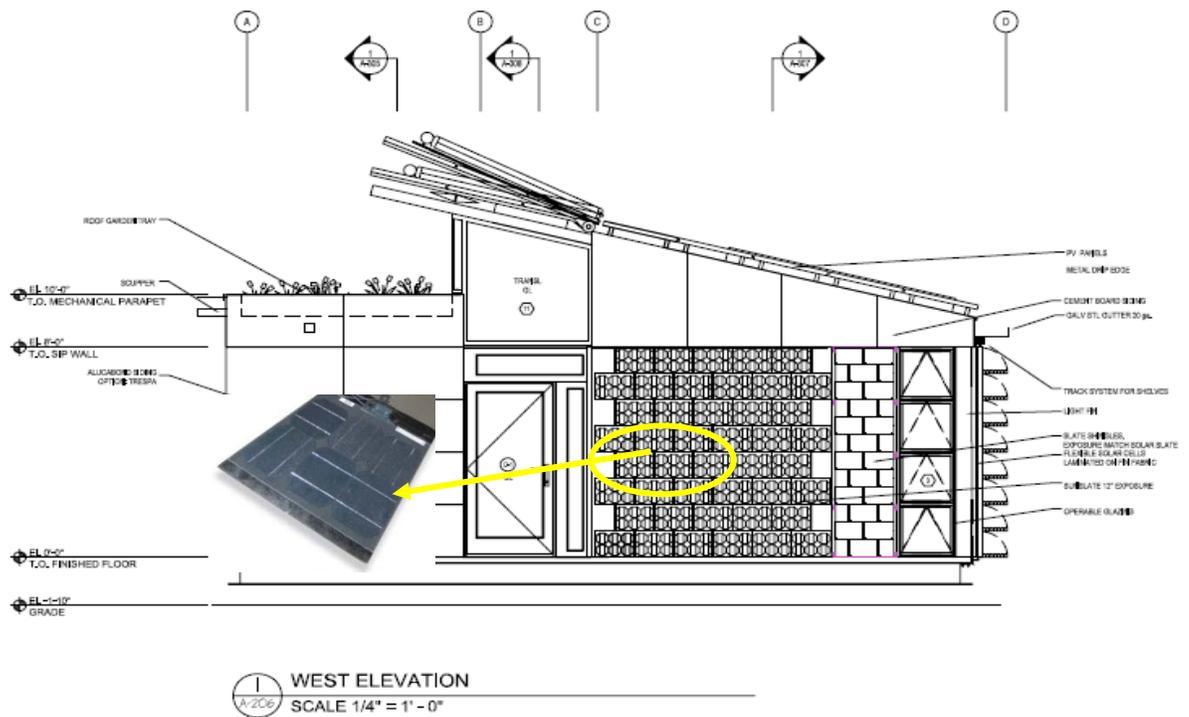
Solar slates mounted vertically on the west wall of the Solar house
